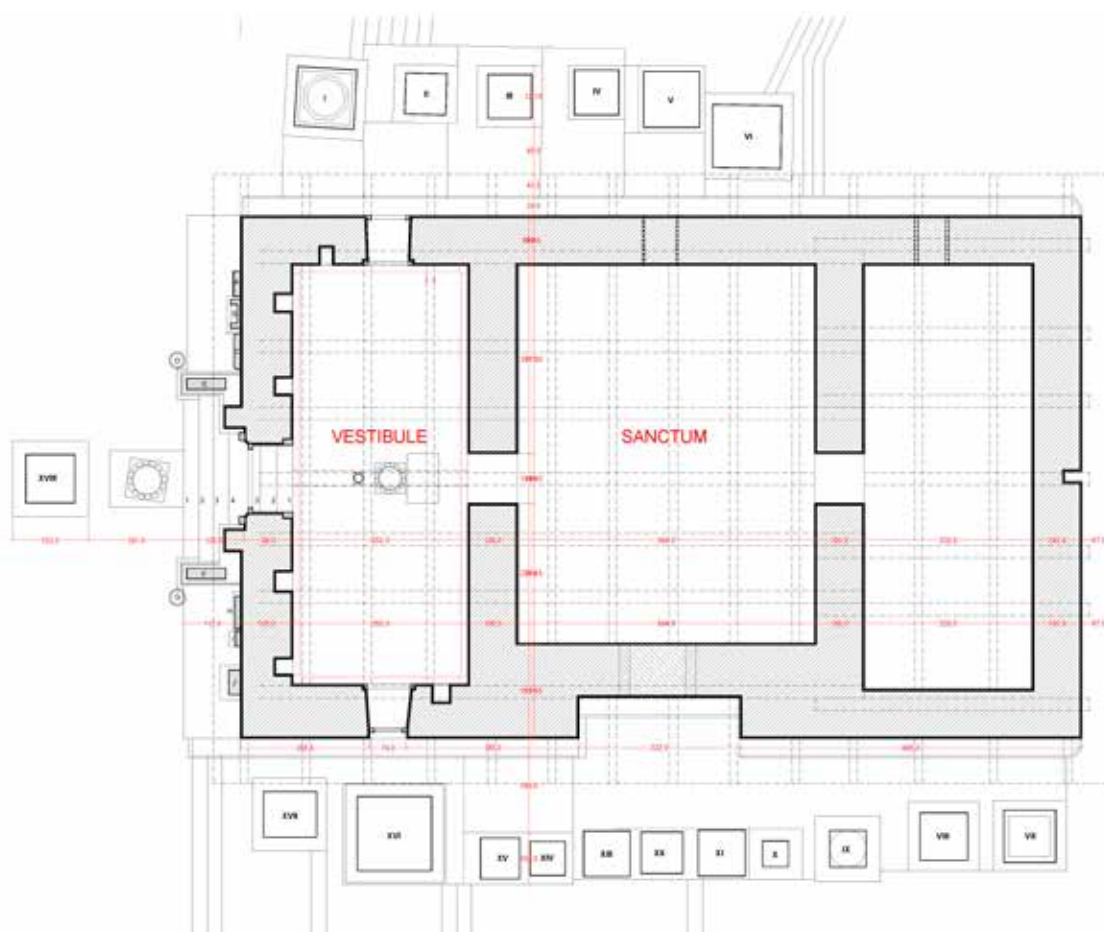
Floor plan of Śāntipur Temple. © Pierre Gérard Bendele, Ludovic Dusuzeau/UNESCO Kathmandu
